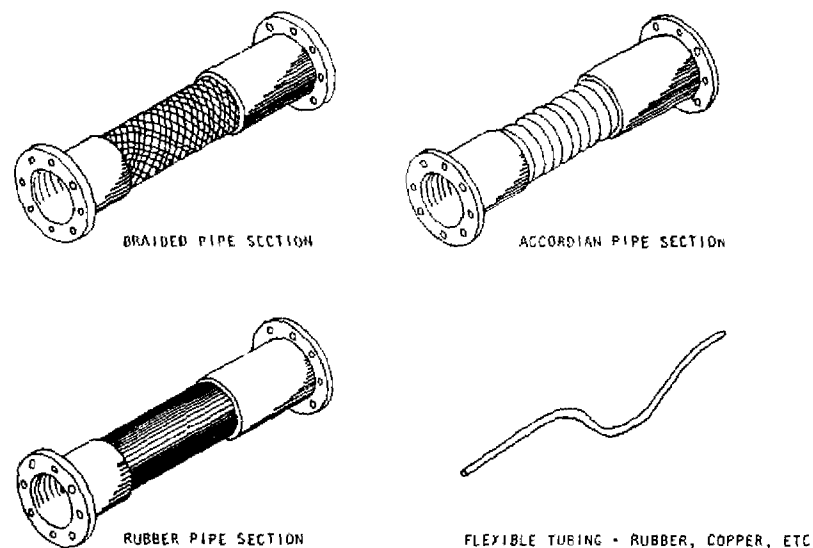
Piping systems. Flexible pipe and tubing connectors.
